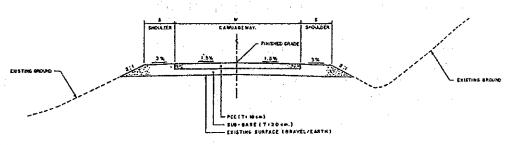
TYPICAL ROAD SECTIONS (4)
